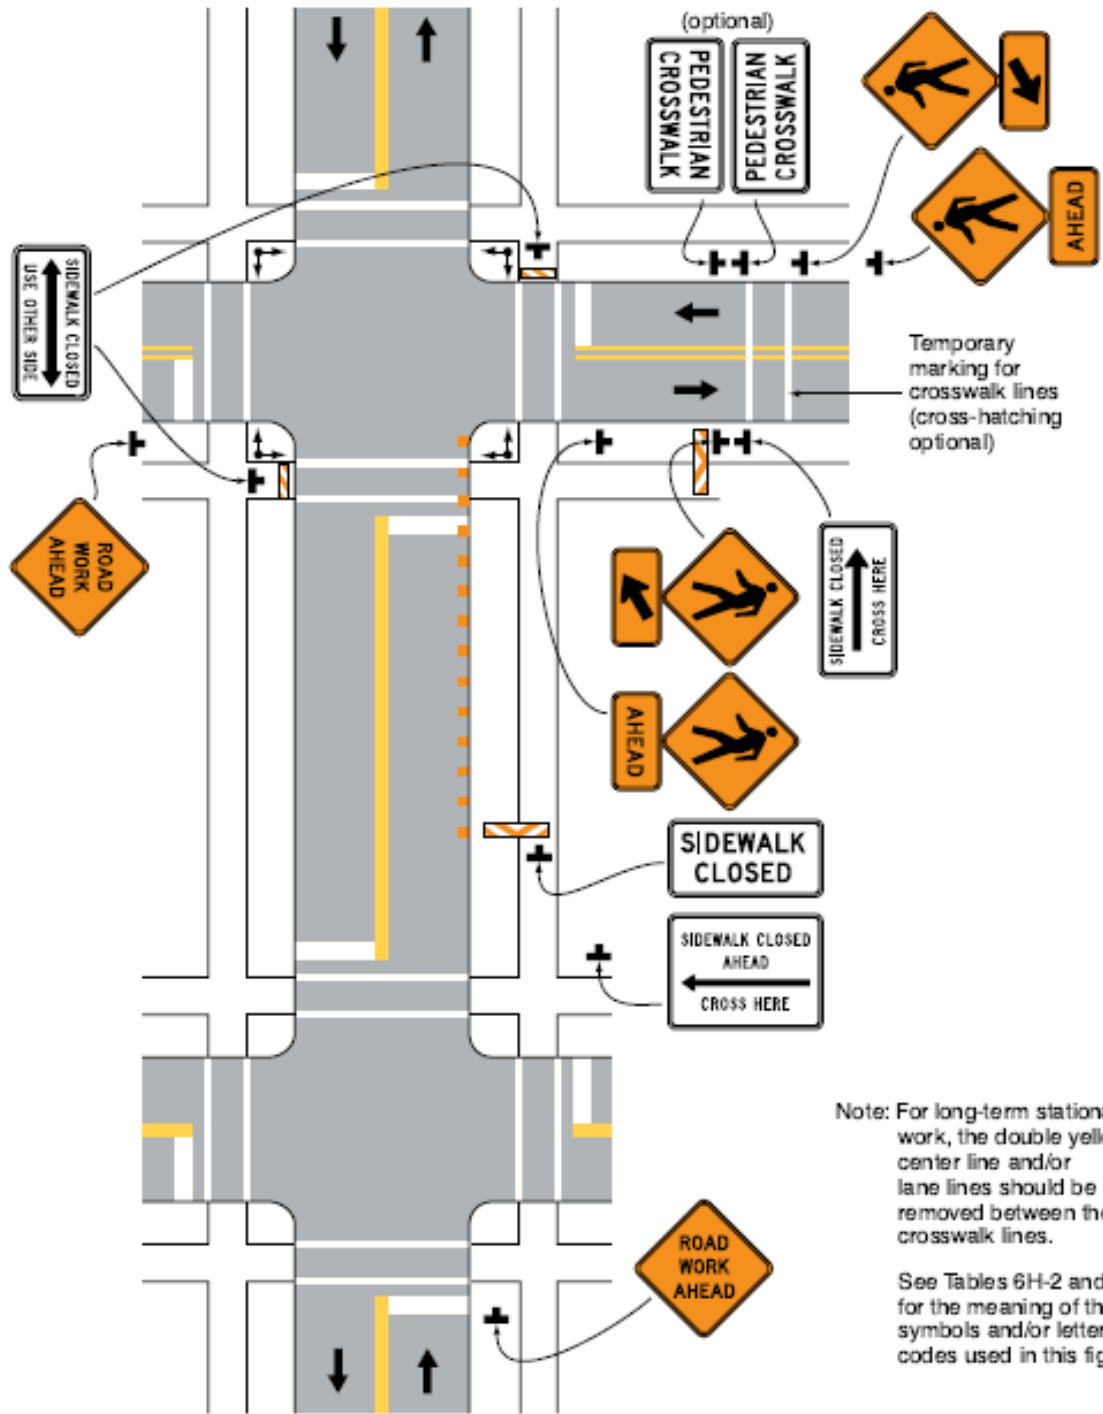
H-28. Sidewalk Detour or Diversion (TA-28)
